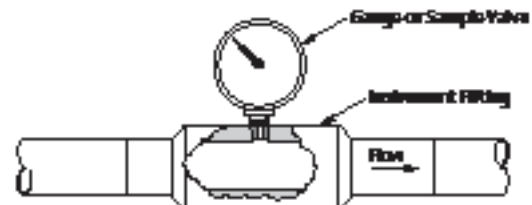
Proper use of instrument fitting to avoid dead space. Can be used with gauge guard.
